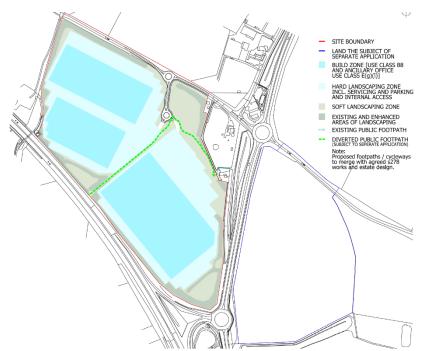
Extract of Western Site Land Use Parameter Plan
